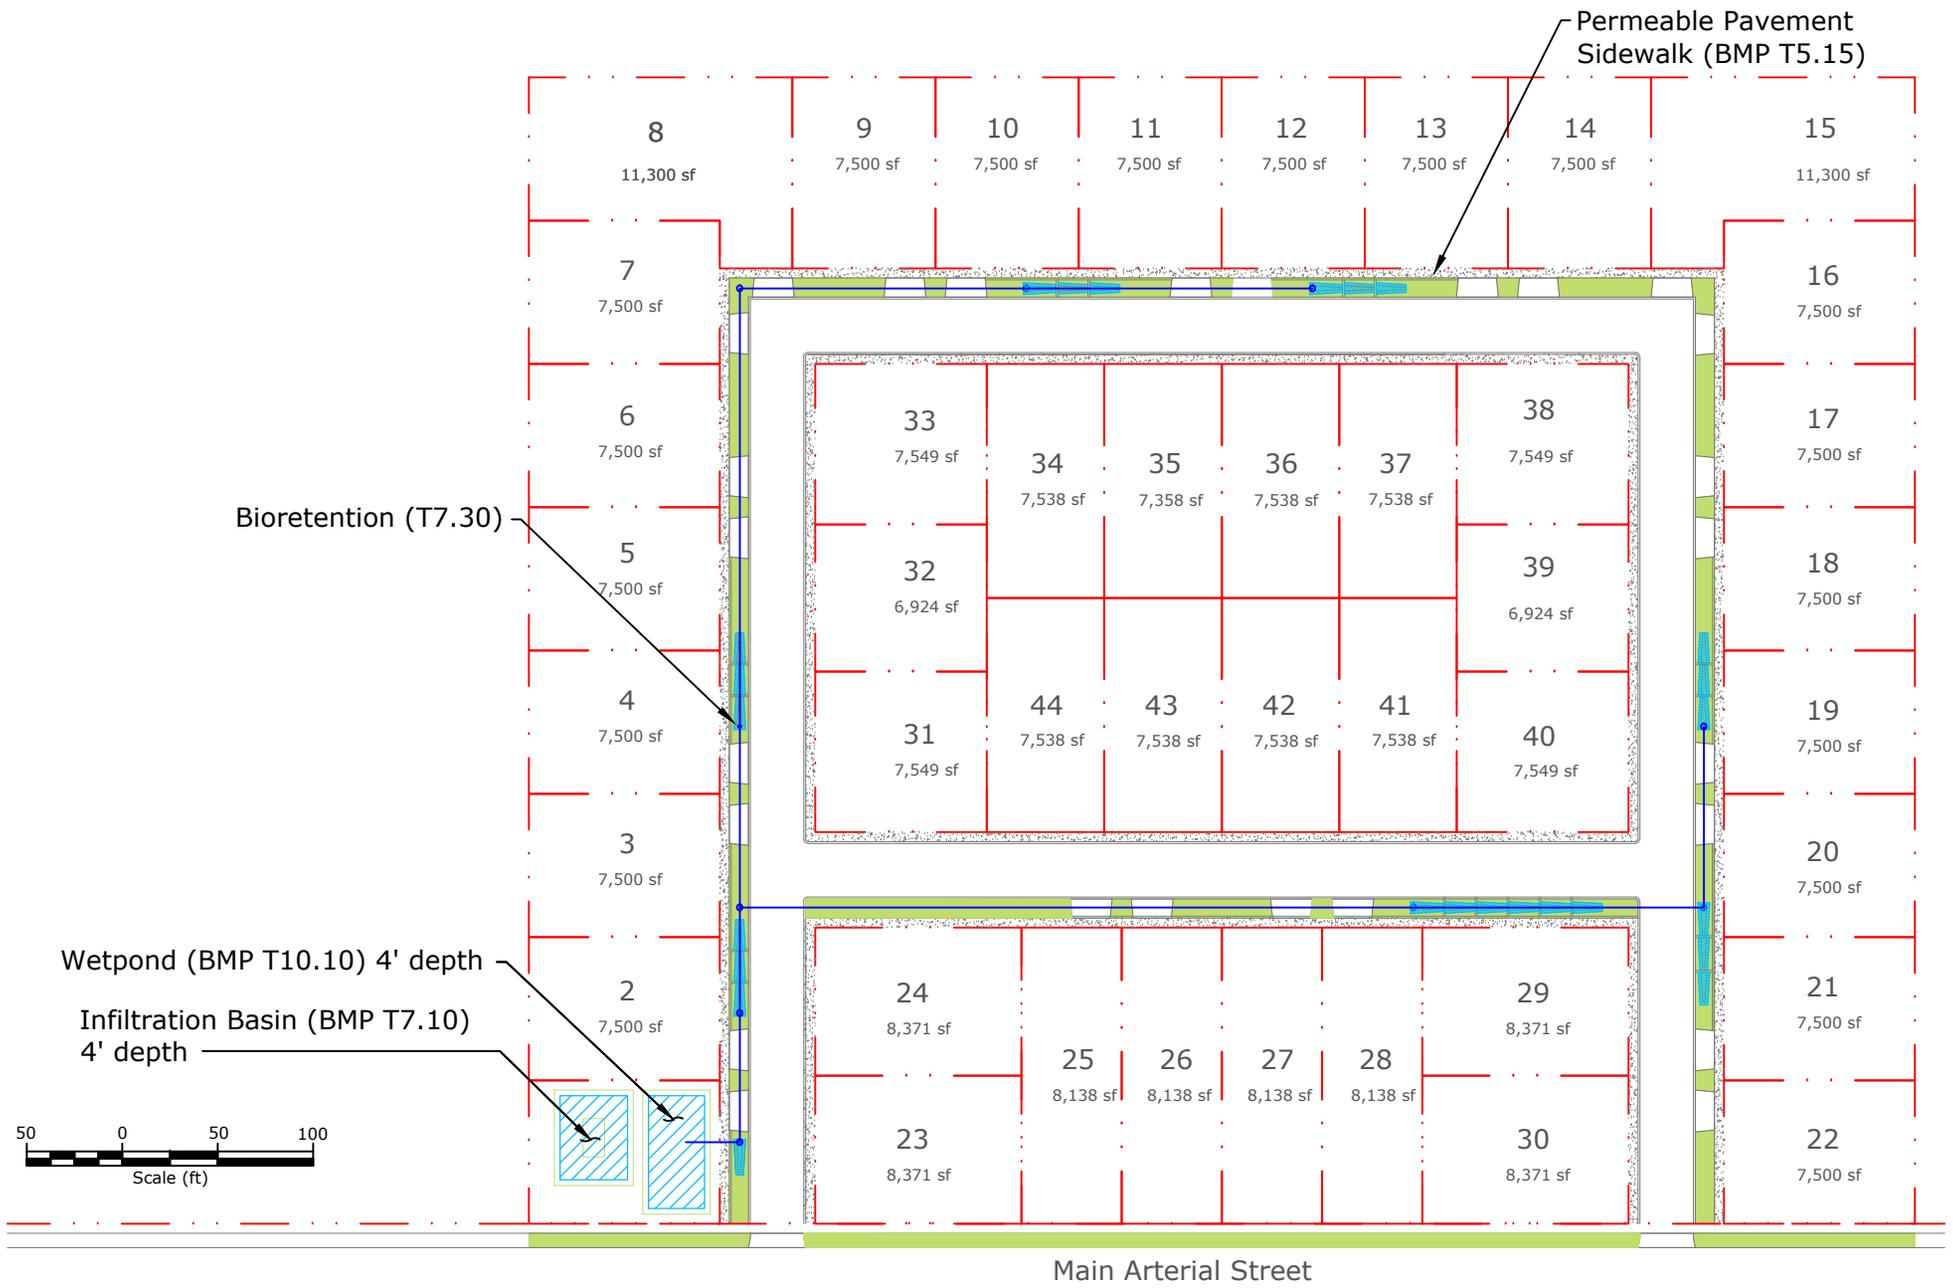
Scenario 3. Permanent Stormwater Site Plan - Typical Single-Family Residential Development, 2012 Requirements, Outwash Soils
